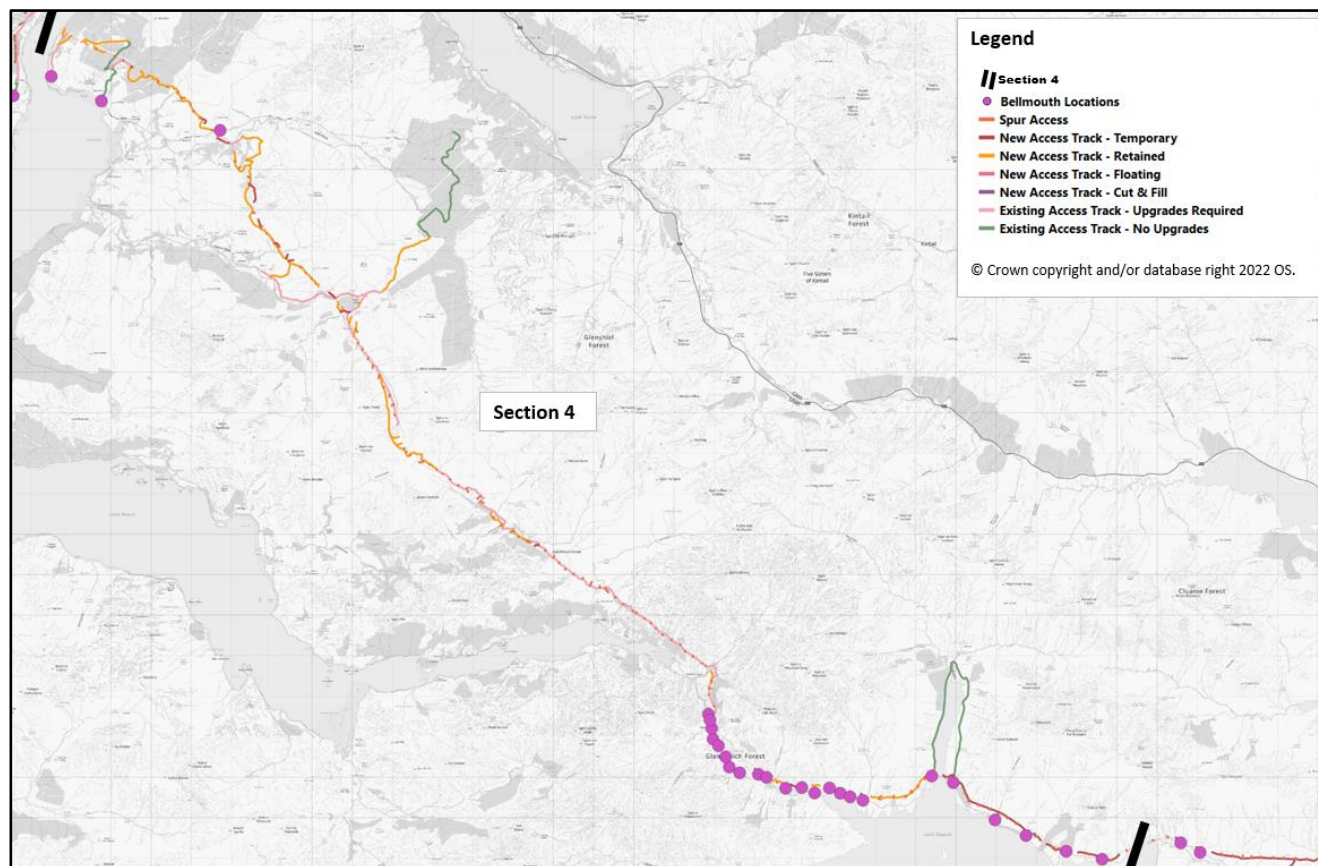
Access Locations – Section 4: Kyle Rhea to Loch Cuaich
